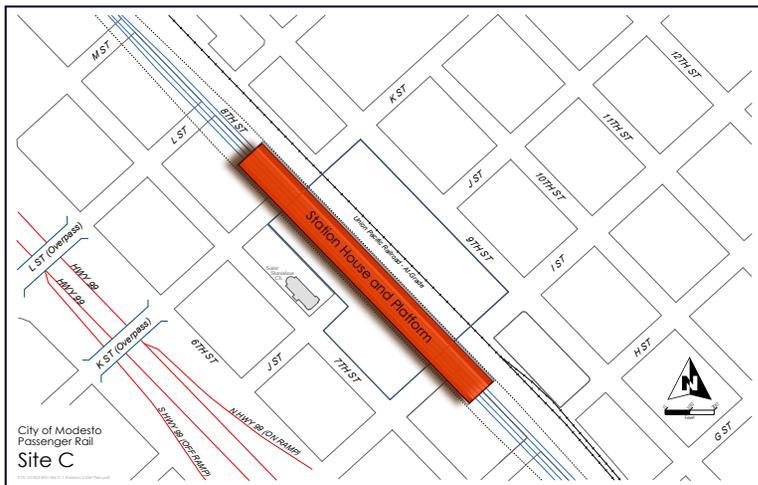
Conceptual Site Plan, Above-Grade Passenger Rail, Upper Level Station House
